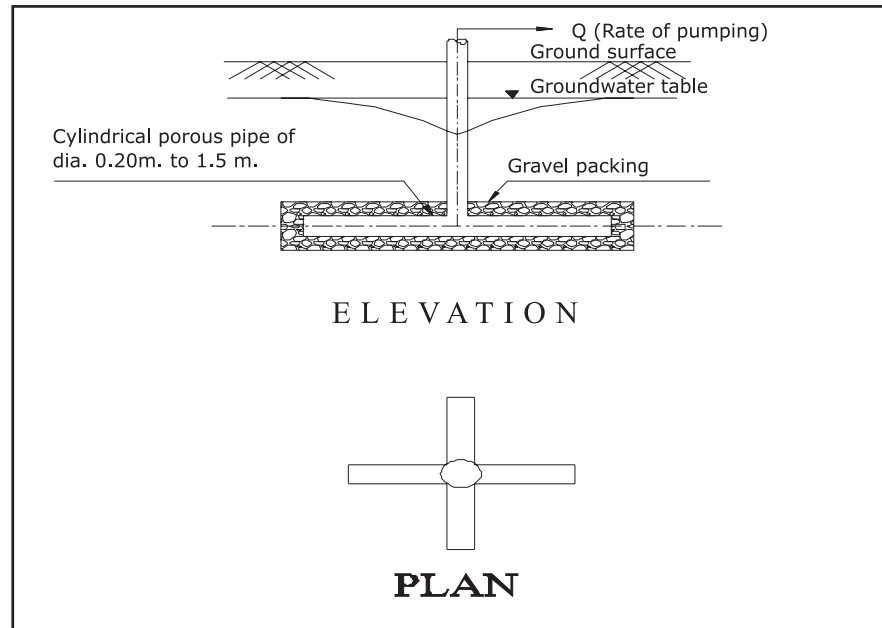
Plan and elevation of a four-legged qanat-well structure.
